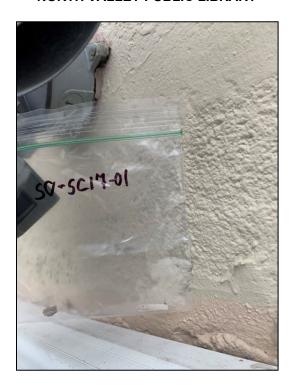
SC17: Silicone outside of east wall of kitchen / staff break room
